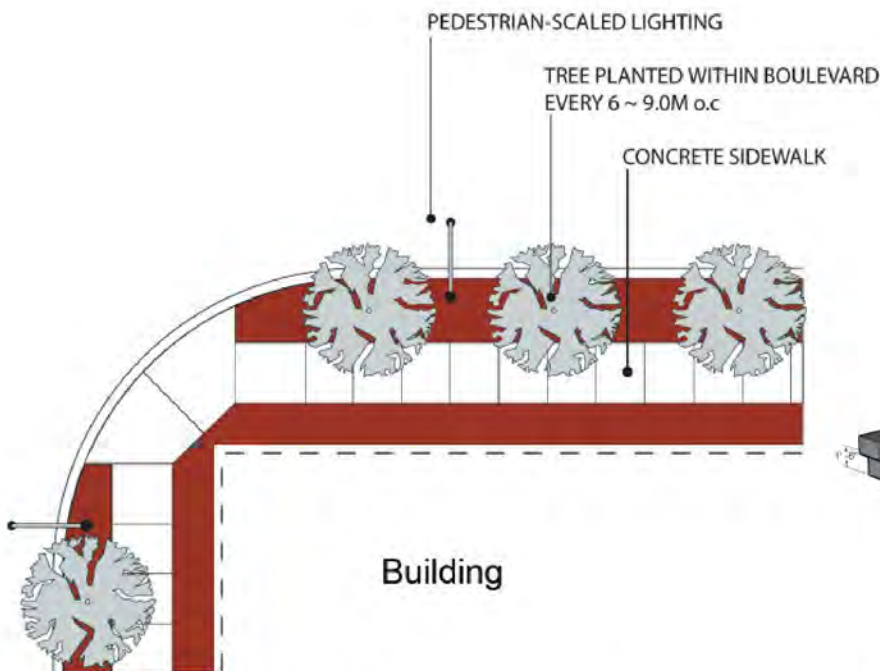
A potential corner plan that incorporates site details to enhance the pedestrian experience.
